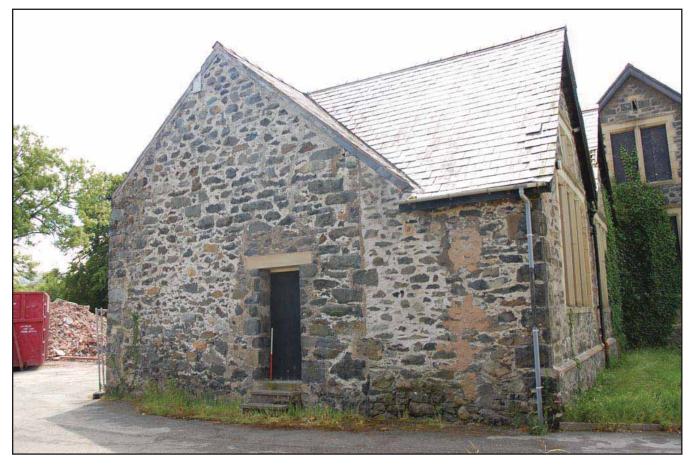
Extension B (Old Grammar School Block) - north facing elevation; note structural phasing to the left of the door. Scale: 1.0m
